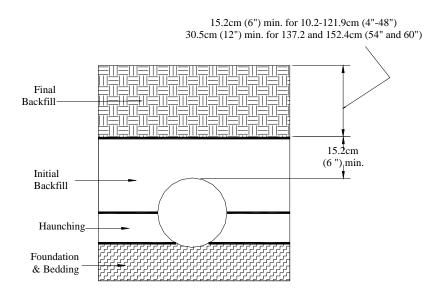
Typical backfill cross section for thermoplastic pipes (Hancor Inc. 2000)
